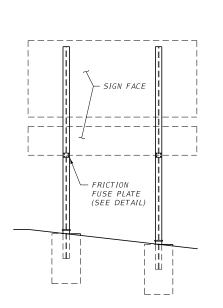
DETAILED DRAWING REFERENCE STANDARD SPEC. SECTION 619, 704
